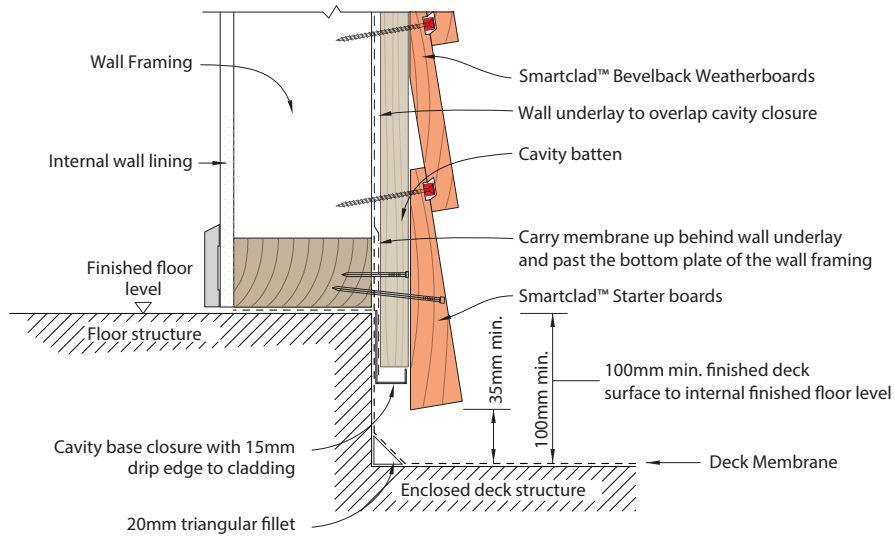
Bevel Back — Base Of Wall — Timber Floor
